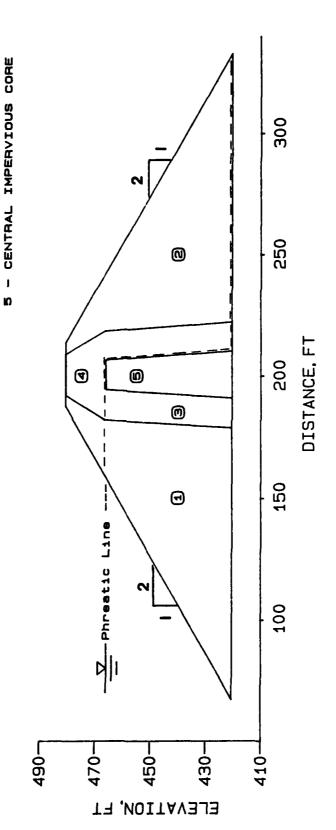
Idealized embankment section of Mormon Island Dam founded on rock and developed from cross-section of dam at Station 426+00
